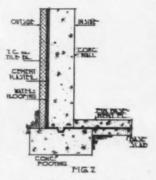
This indicates an effective method of dampproofing a basement wall and floor where the soil would carry a heavy volume of water under very severe conditions of moisture.
